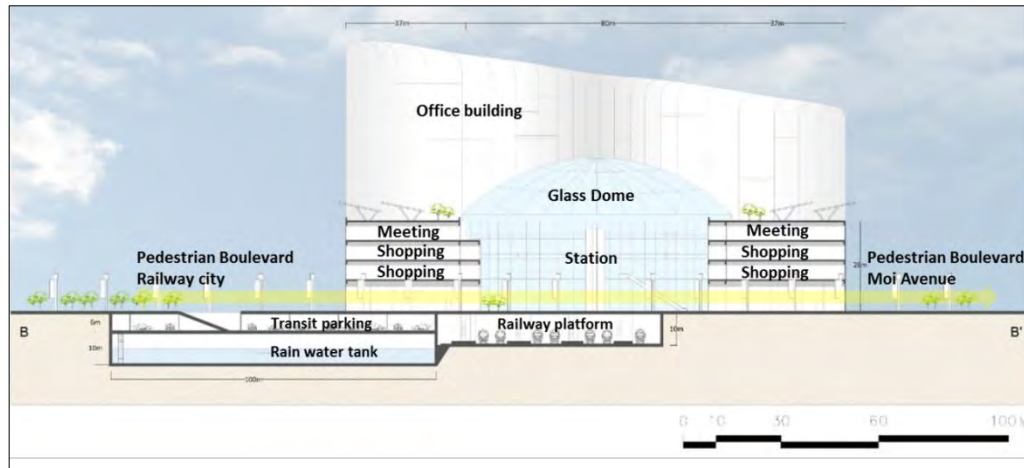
Architecture Drawing of New Central station (Section-2)
